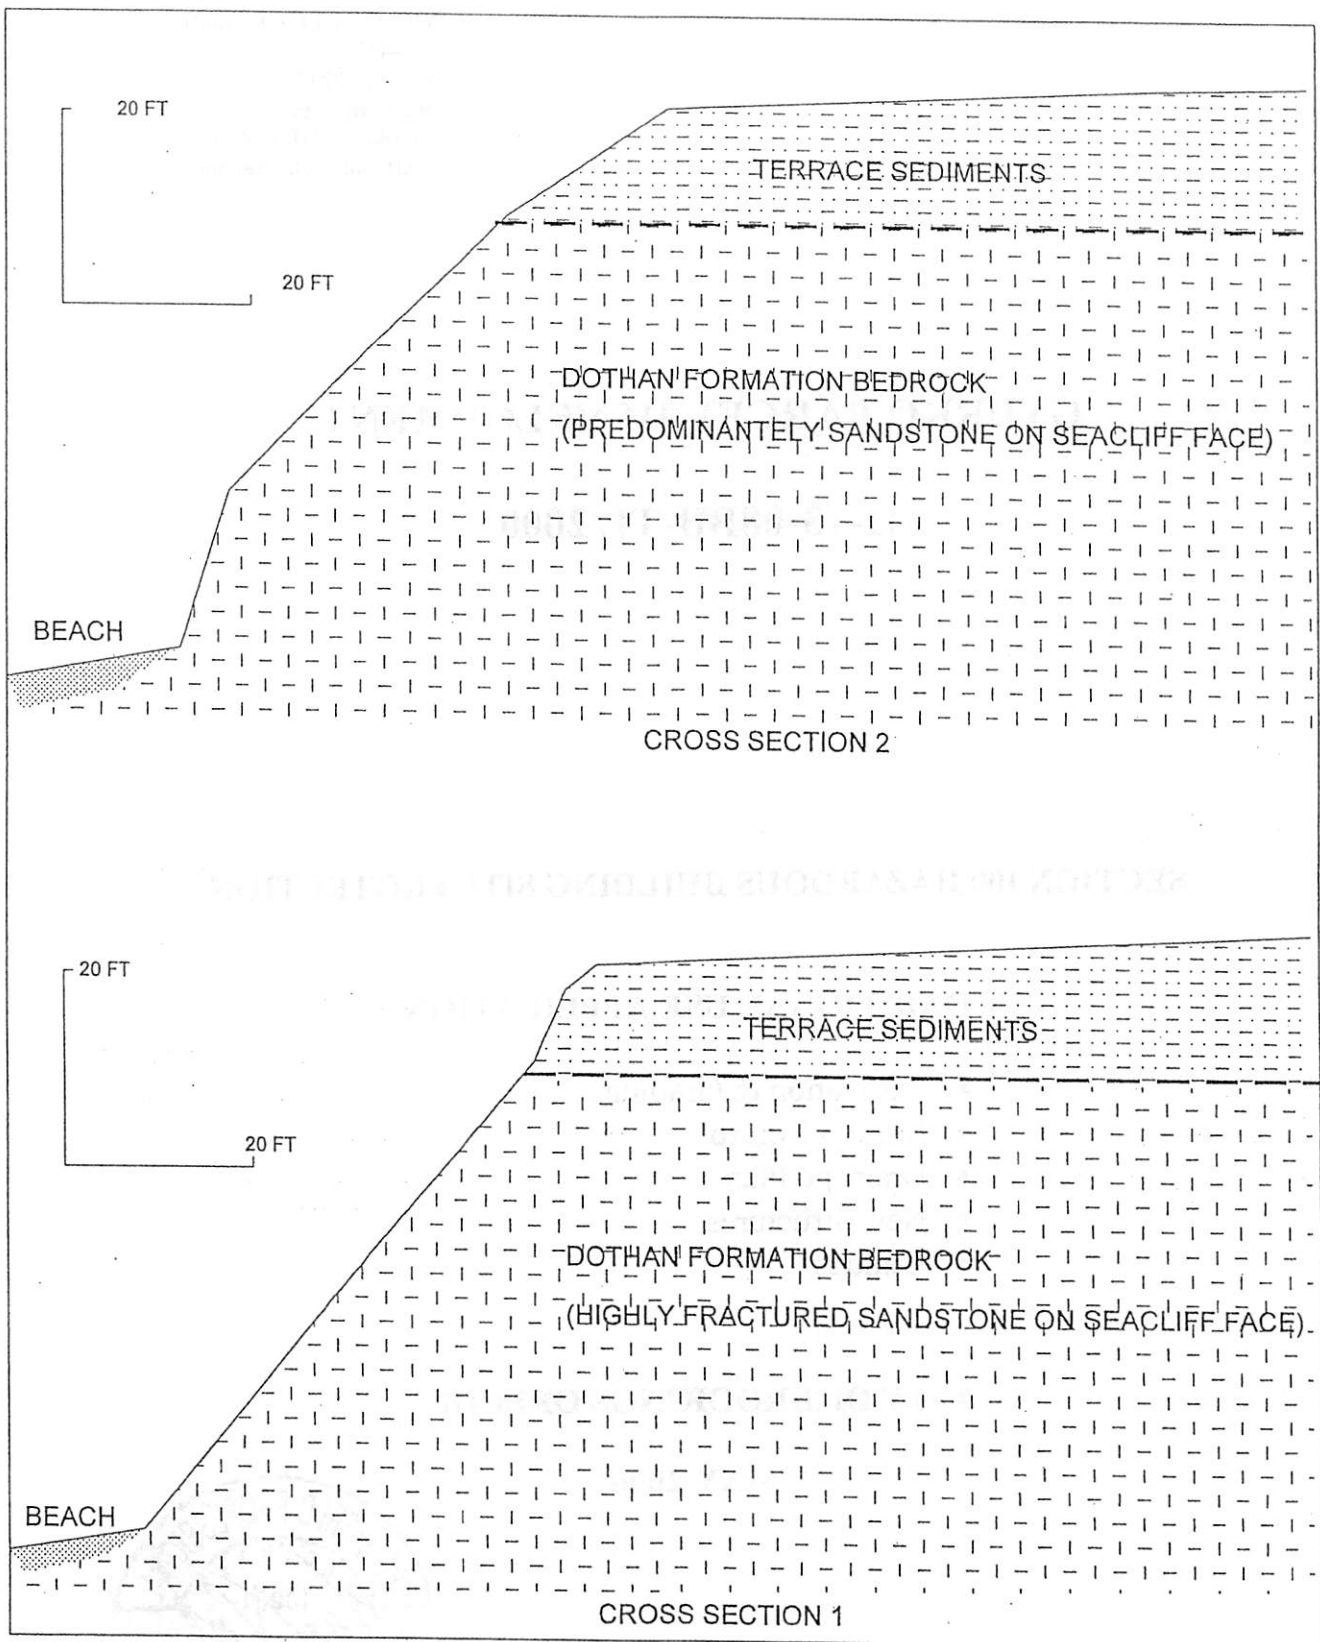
Cross sections across part of TL 2000 41-13-8BB, 19 Tanbark Road, Brookings, Oregon.
